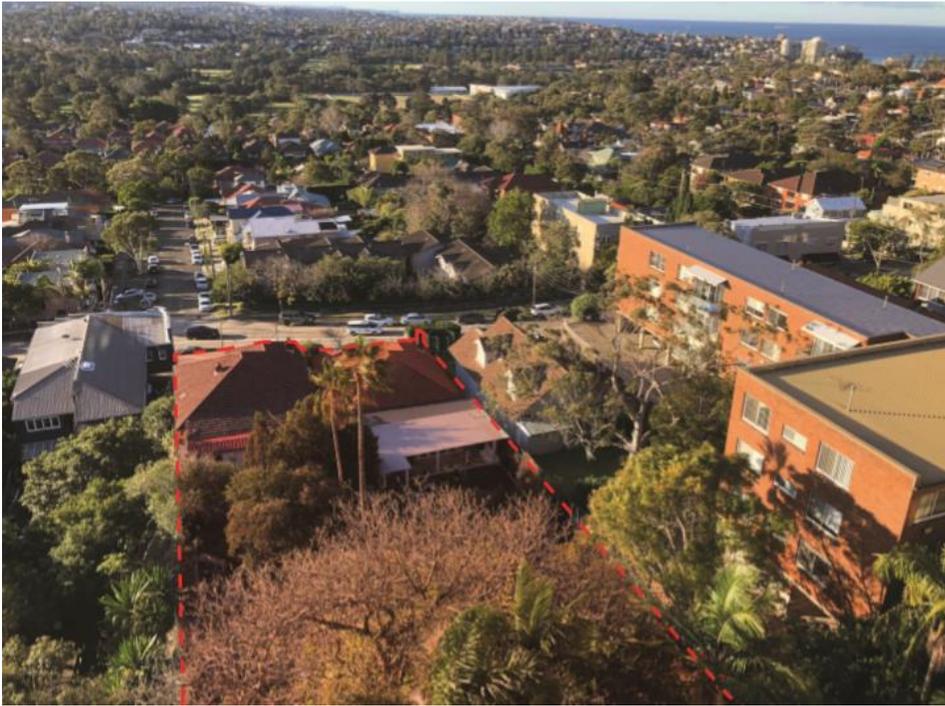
view looking north of subject site with 189 Sydney Rd to the right (source: Modularium)
